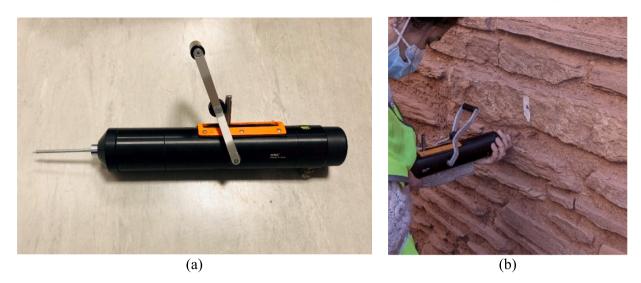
Penetrometer test: (a) equipment; (b) in operation.
